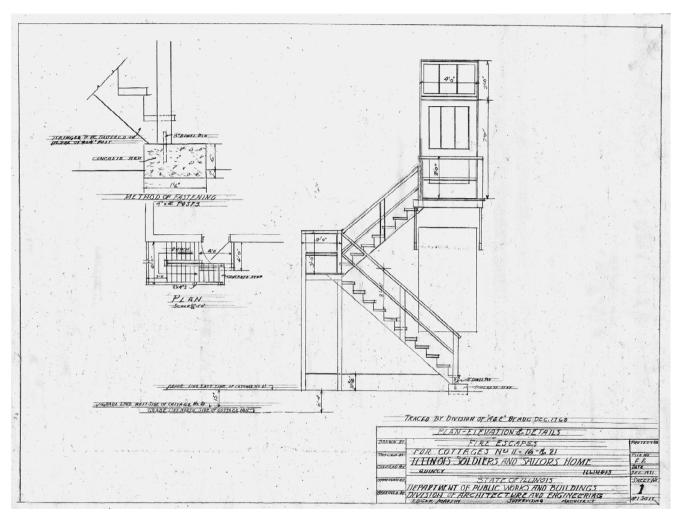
Plans for the fire escapes installed on Building 11 and its two sister cottages (Buildings 16 and 21) in 1921. A fire escape was placed on each end wing of the building. During this construction phase, original window openings were converted into doorways to provide access the fire escapes.
